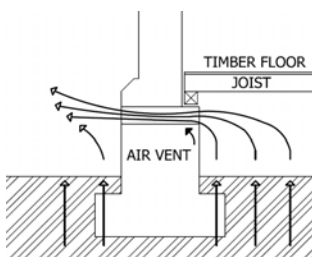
Well-ventilated underfloor space allows soil moisture to evaporate to the open air [2]
